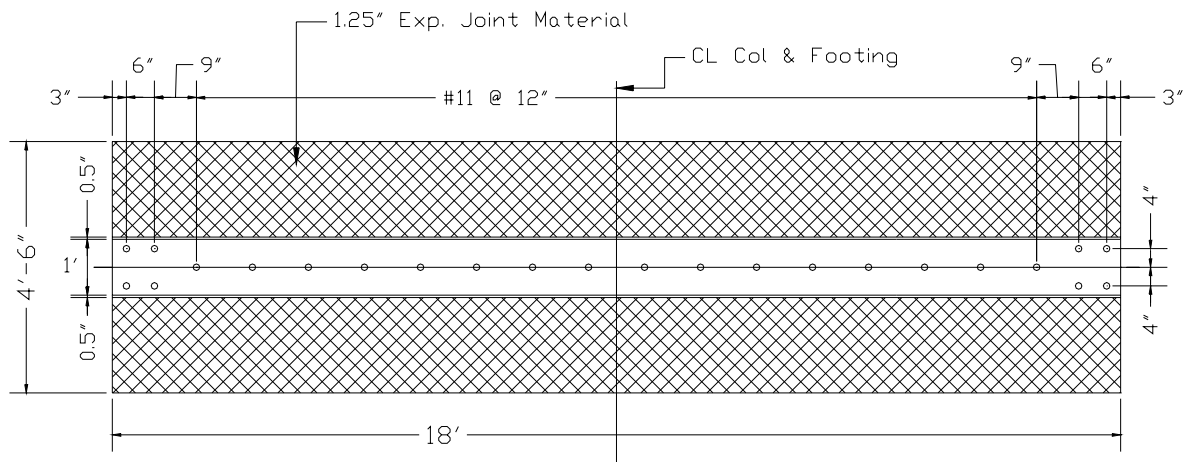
Detail of hinges on top of the footings of 1RWL-2RWL off-ramp
